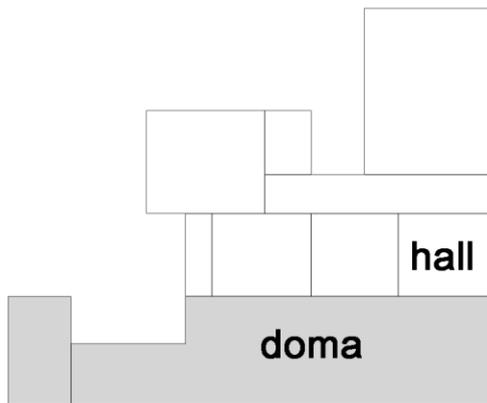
Typical plan 1 (Takasaki old residence)
